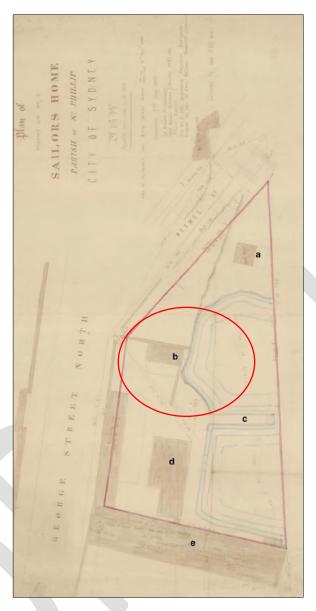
1861 Plan of the proposed site for the Sailor's Home (former) showing the original site boundaries granted by the Colonial Government and extent of land reclaimed to form the site. This was formerly used by the Water Police but was vacant at the time. Structures noted include a) Dead House; b) unidentified structures at subject site; c) Wharf; d) Cadman's Cottage; e) Colonial Storekeeper's Department Store (outside the proposed site). The subject site is circled red. (Source: State Library of New South Wales, M2 811.1719/1861/1)
